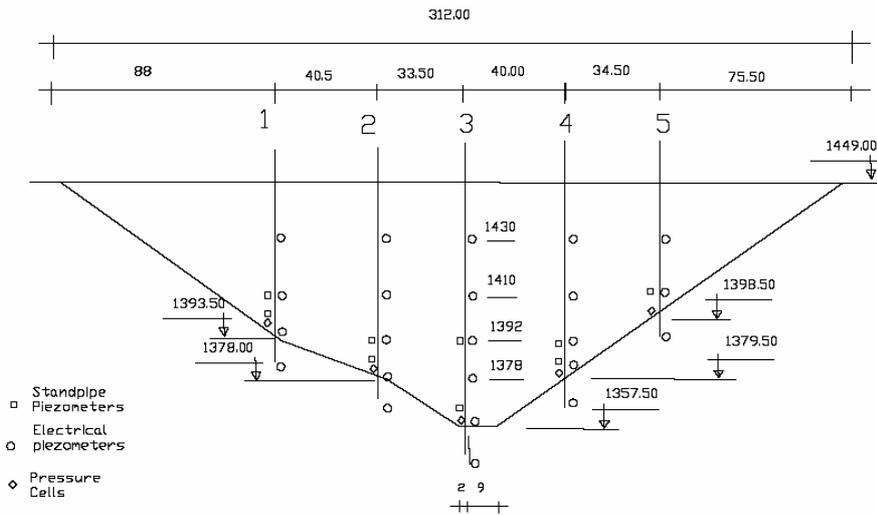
Details of monitoring sections at the cross section of the dam valley
